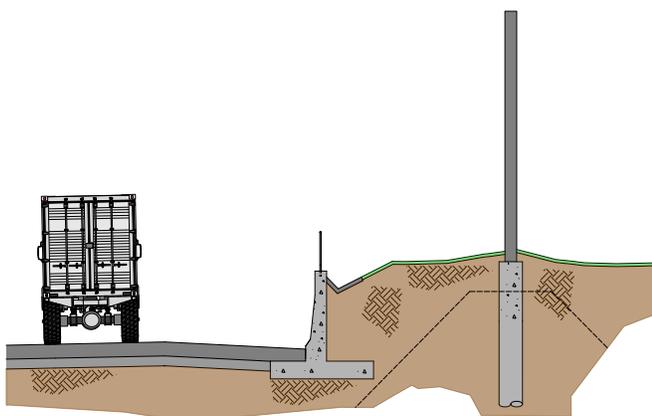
/ Durable Materials and Design Approaches | Retaining Wall No. 2
